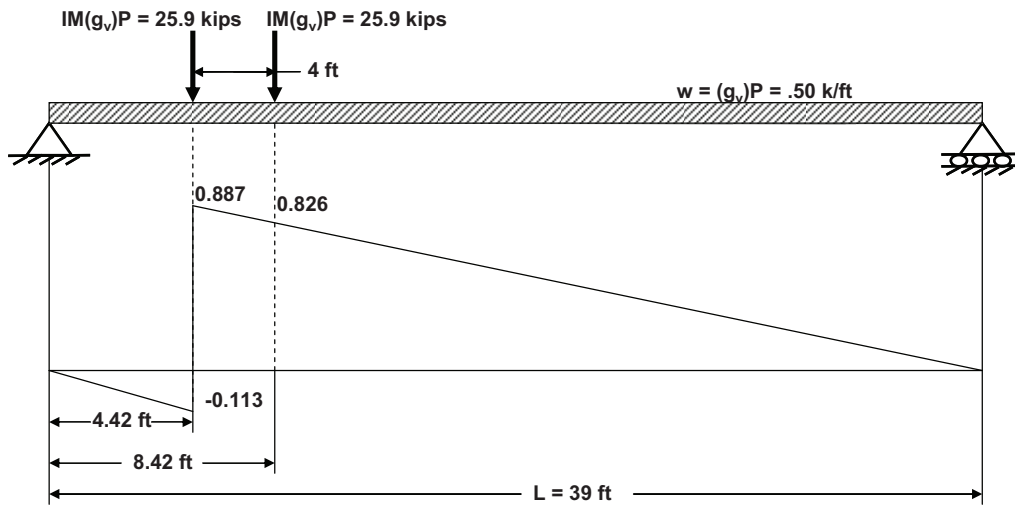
Exterior Beam Shear Design Tandem at 4.42 ft from support
